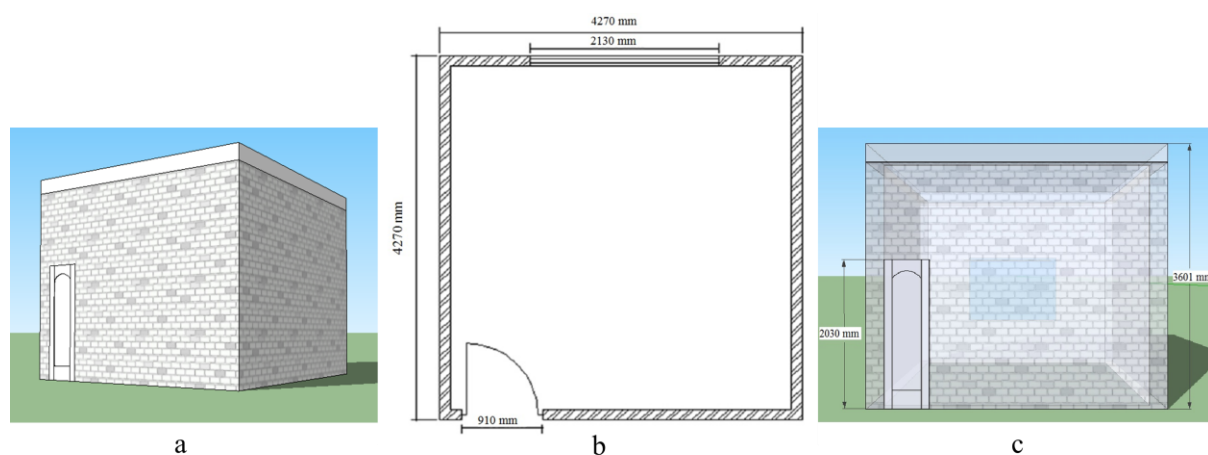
a) Prospective view, b) Plan c) Elevation of prototype room being drafted in Google sketchup and Autocad
